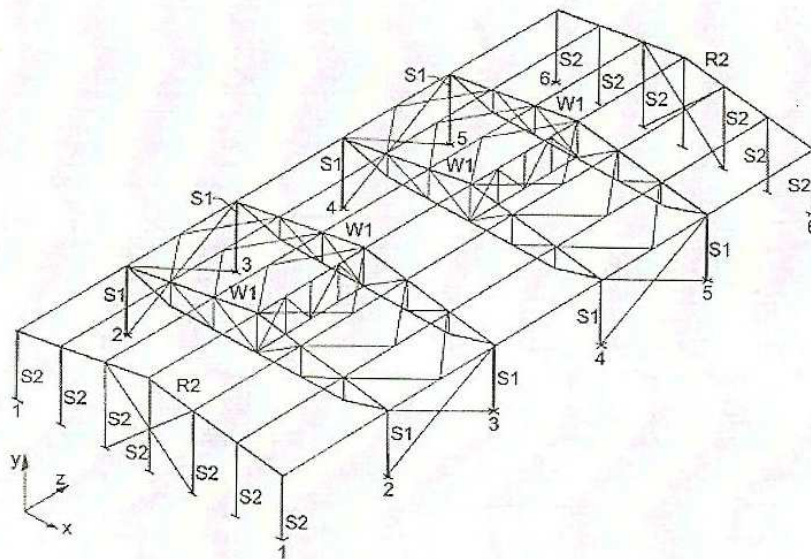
Scheme of industrial building with braced endwall: S1- primary column, W1- frame rafter, S2- endwall column, R2- endwall rafter
